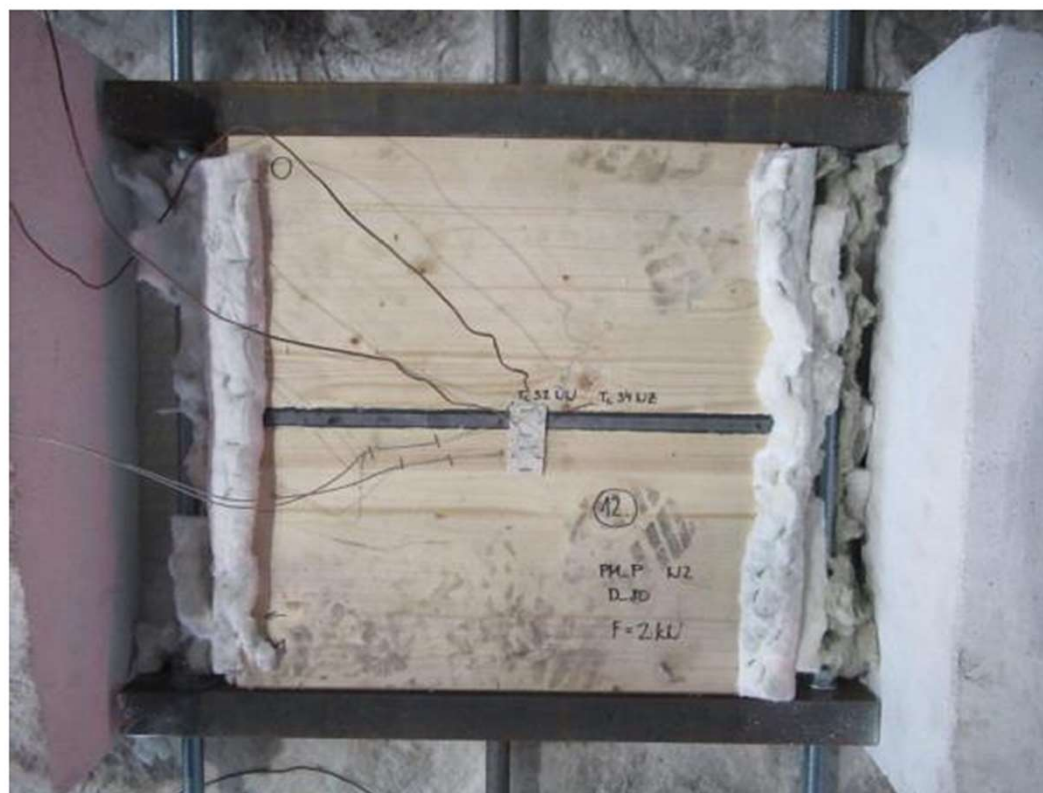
Thermocouple placement in specimen no. 12 (photo archive 049506d-270)
